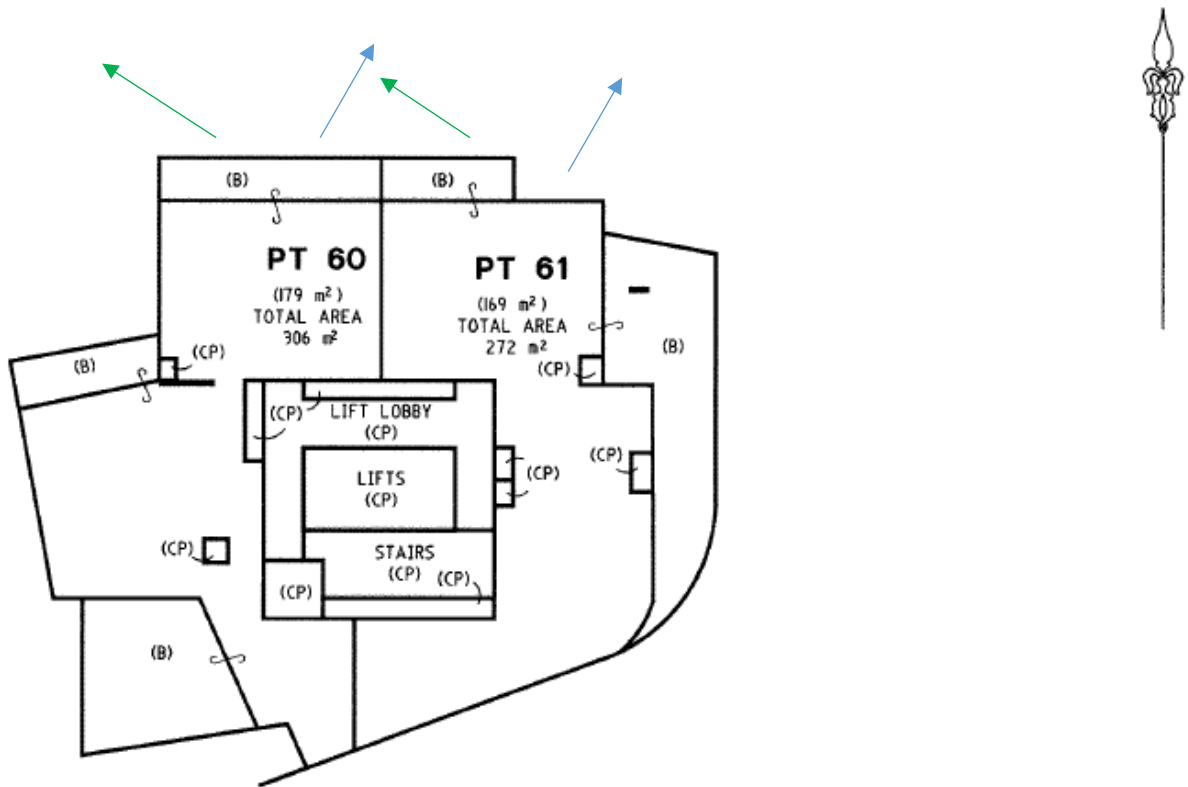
Strata Plan layout of Level 15, at 417-419 Bourke Street, Surry Hills
